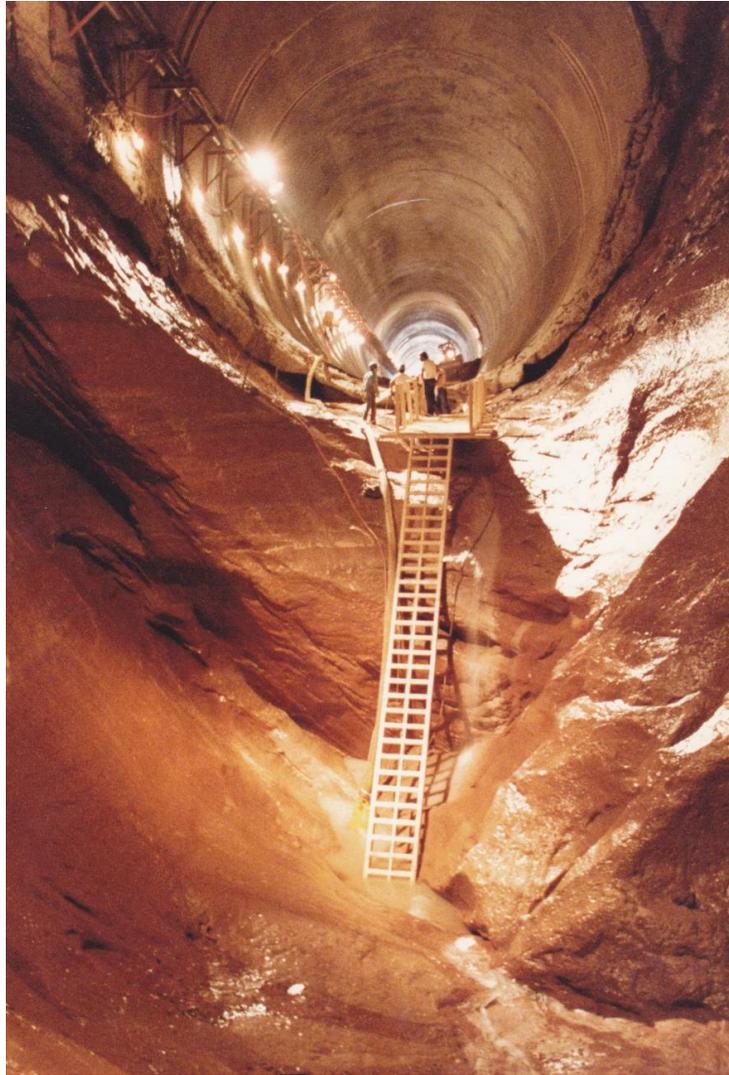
Cavitation damage can be very extensive, as shown here, where the damage extended deep into foundation material.
